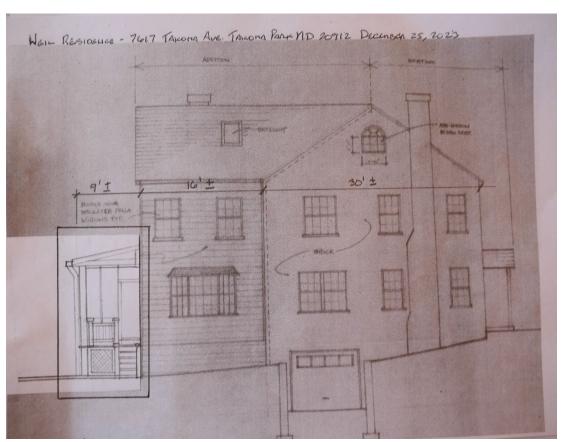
The left-side elevation of the residence as it will appear on the broader elevation.
